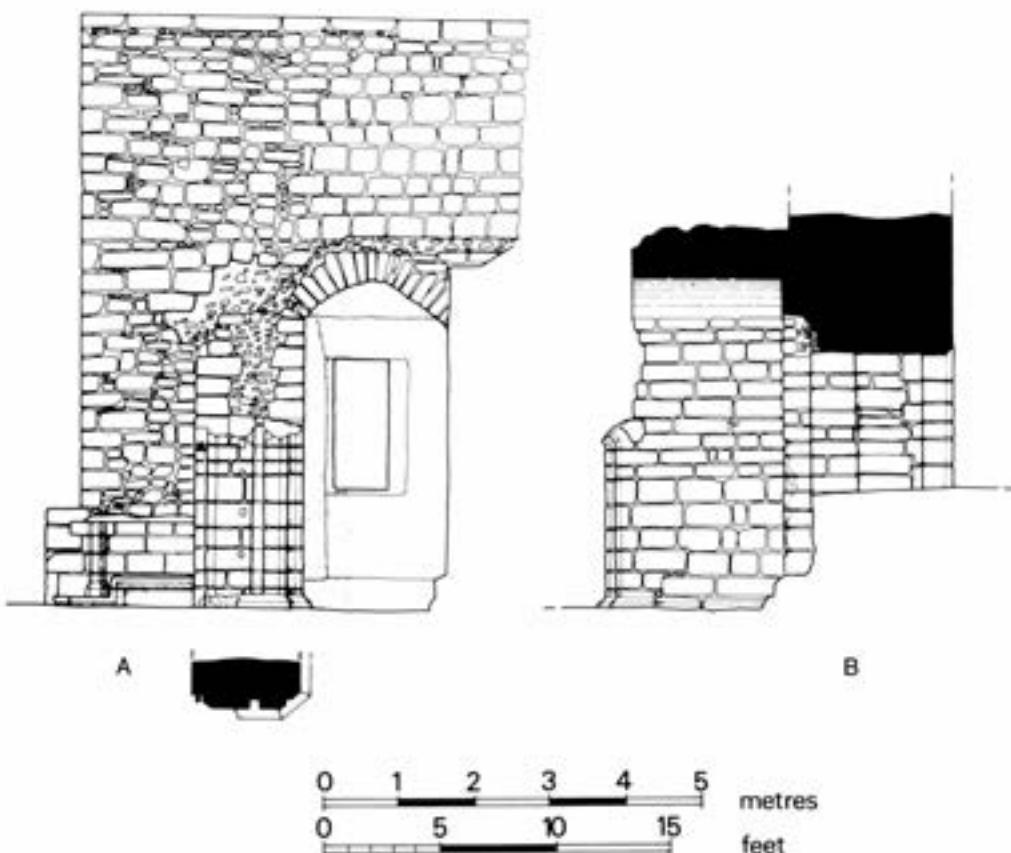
Elevations of Queen Mary's Tower: right the passage to the Dacre postern; left the east wall of the Dacre postern and the arch into Queen Mary's Tower
